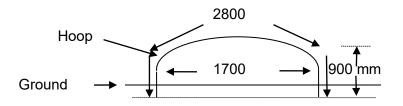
Construction of shading structures. Galvanised steel hoops are forced into the ground and clad with shading fabric.
